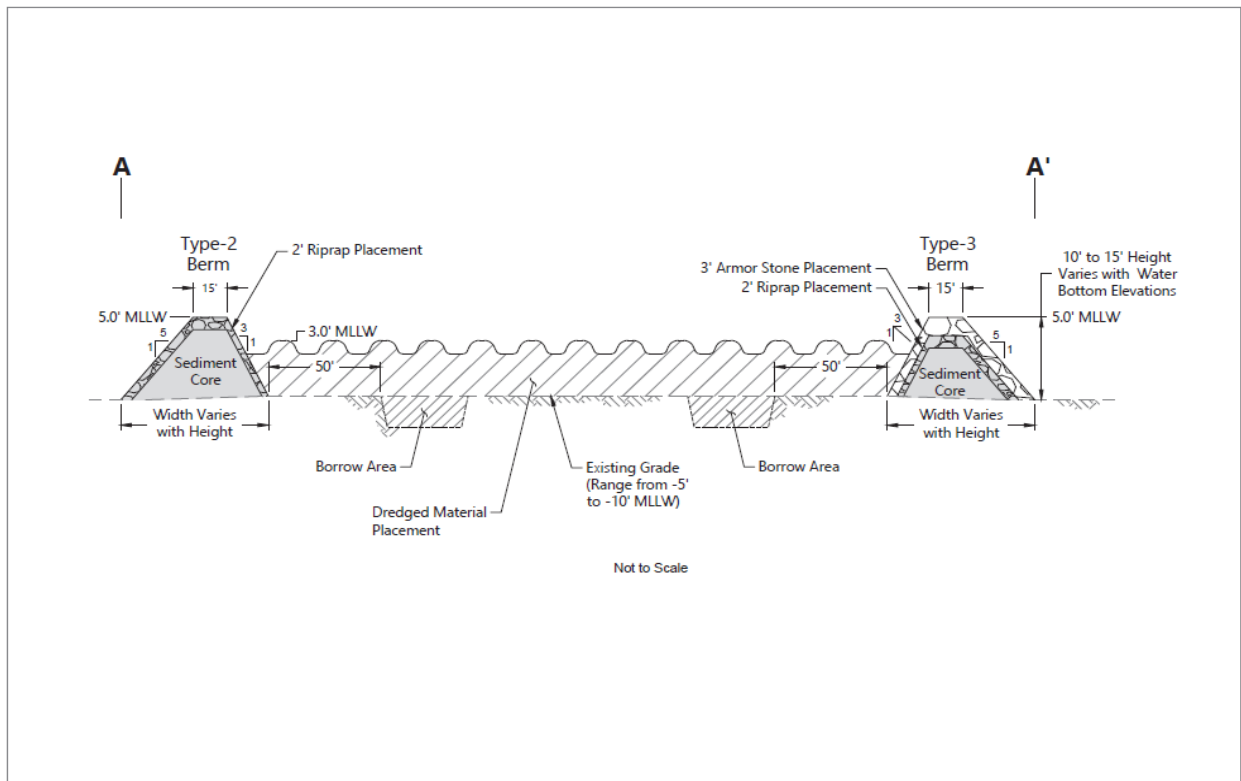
Diagram showing construction parameters for proposed beneficial use site
